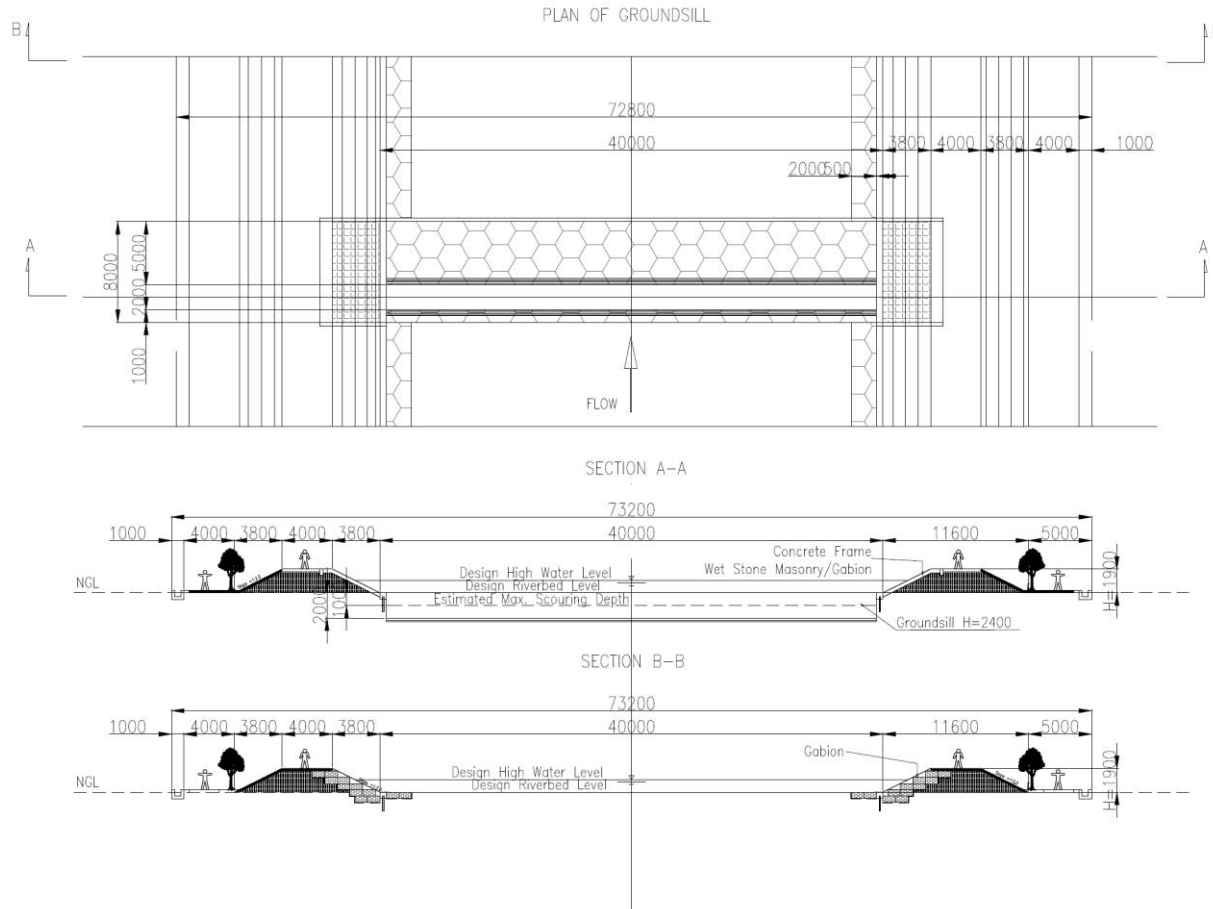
Plan and Cross-Section of Groundsill, and Typical Section of Mzase River Training Works
